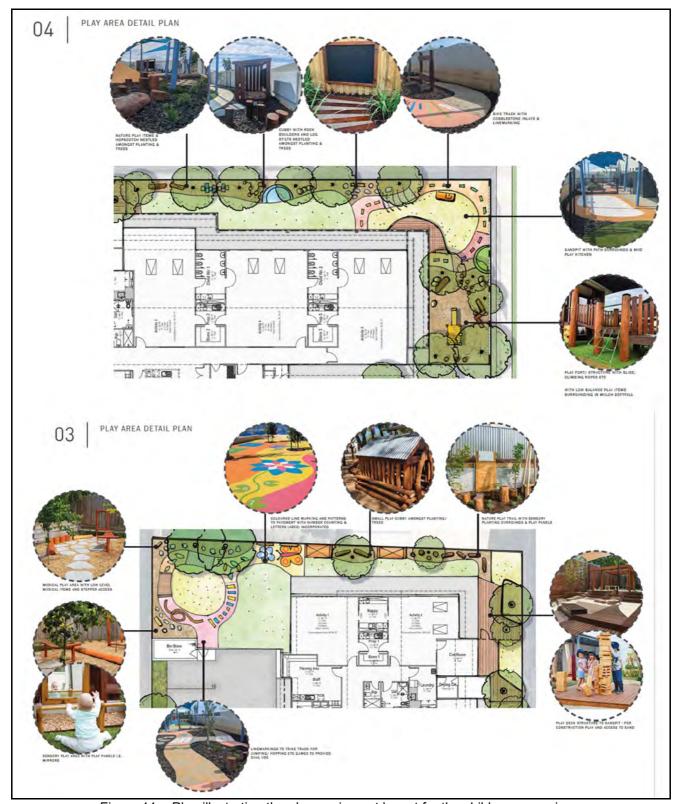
Plan illustrating the play equipment layout for the child care premises.
